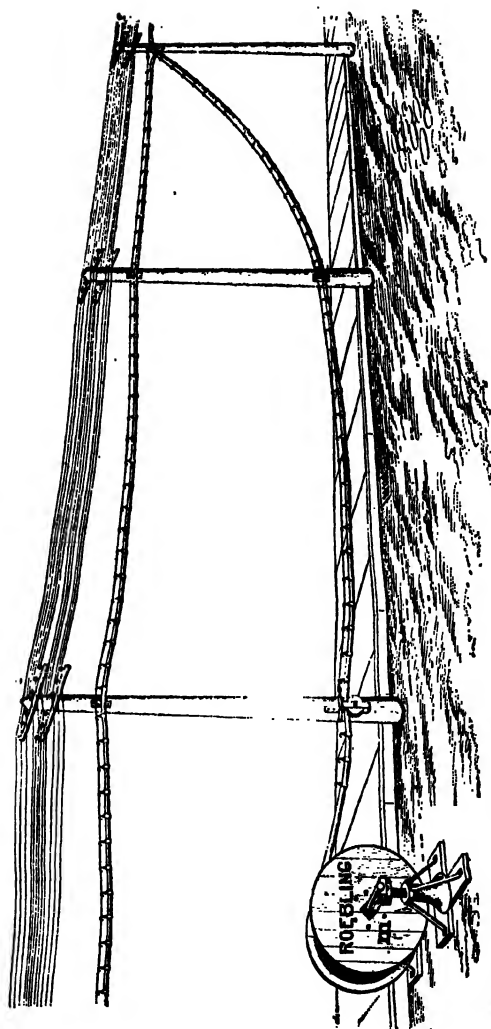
Method of Stringing a Telephone Cable, Showing the Mounting of the Cable Reel
